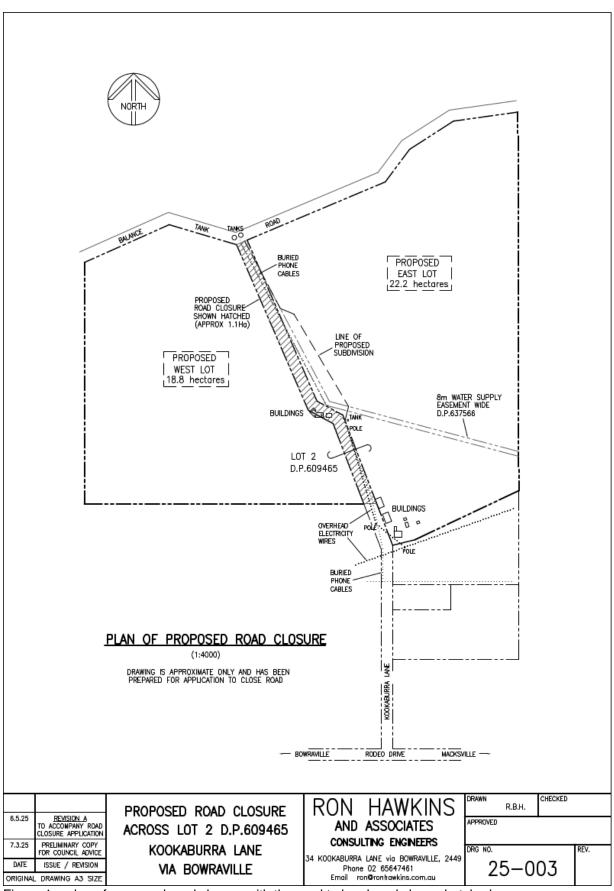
plan of proposed road closure with the road to be closed shown hatched
